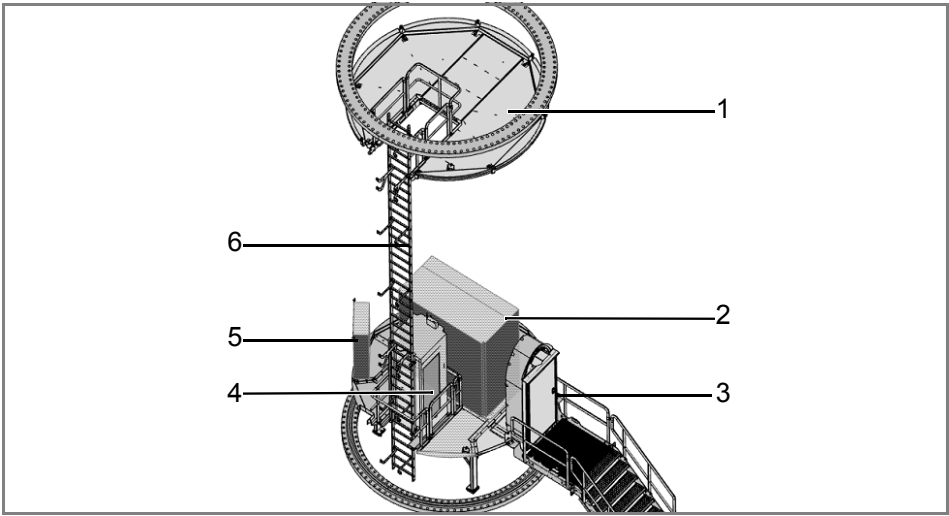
Overview of installations in the bottom section of the steel tube tower
